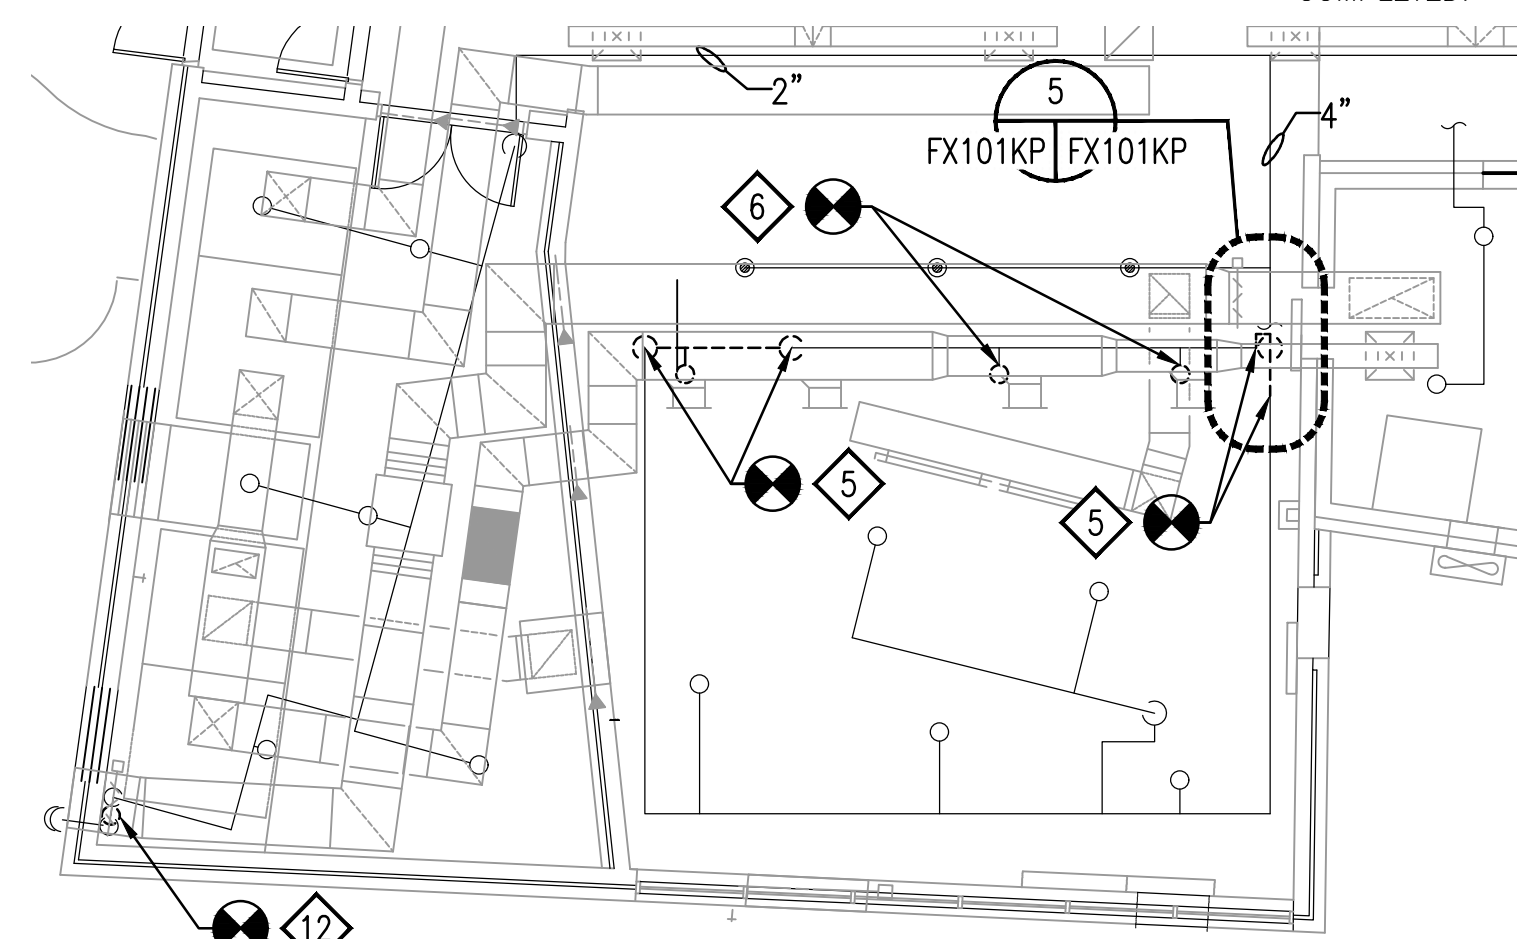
DETAIL - INSPECTOR'S TEST MODIFICATION - WEST MECH ROOM
